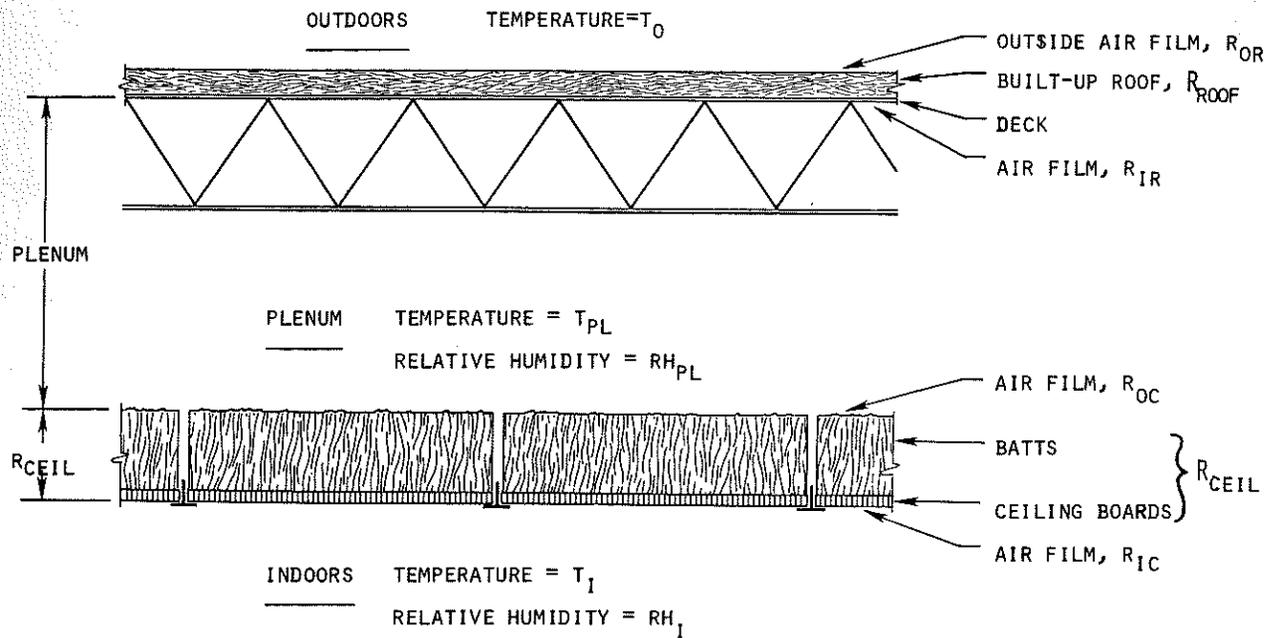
Cross section of typical insulated suspended ceiling-plenum-roof section
